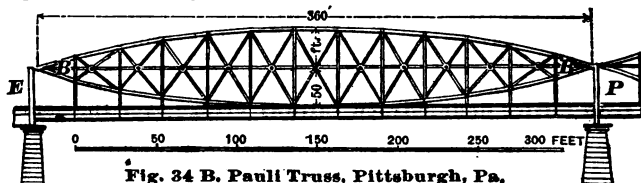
B. Pauli Truss, Pittsburgh, Pa.
